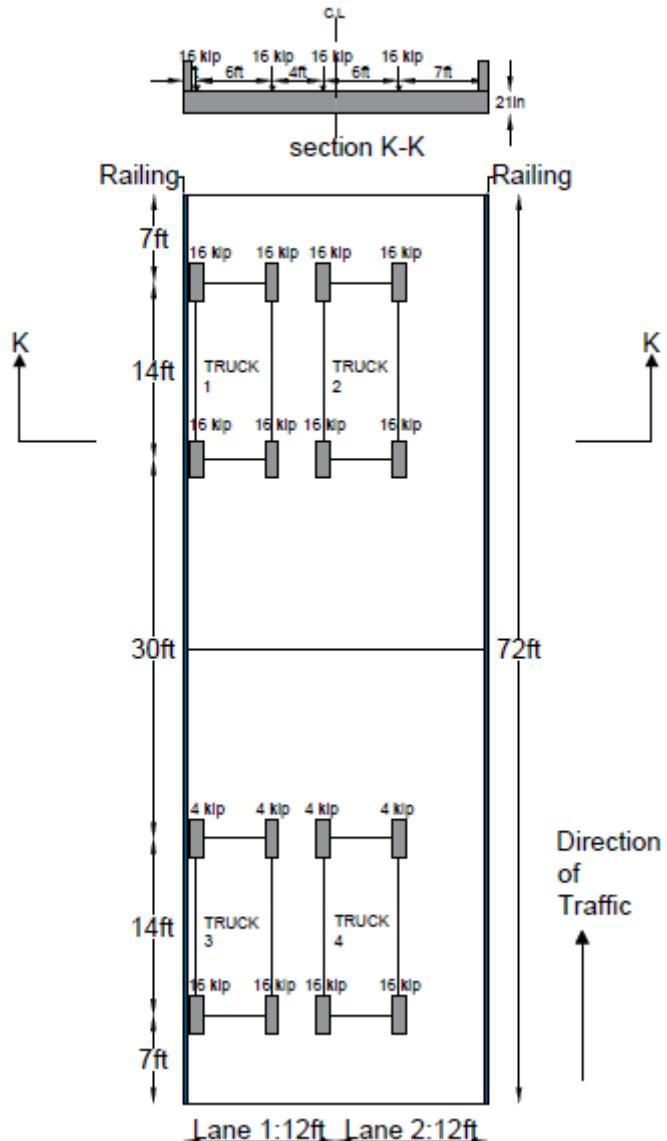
Typical Cross-Section and Plan of a Two-Lane 36ft straight Bridge with One Railing(Left) under Edge Loading (Positive moment).
